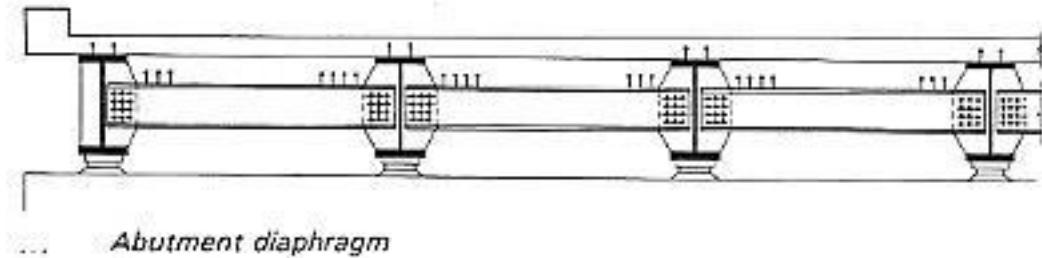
Universal beam multi girder deck abutment section connected with beam type bracing. (Source – SCI publication 065)
